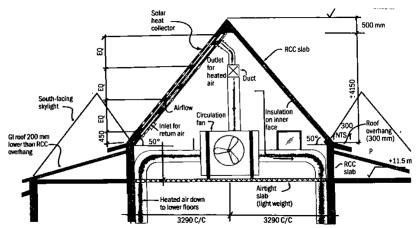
Roof space collector (Source: Energy Efficient Building in India)
